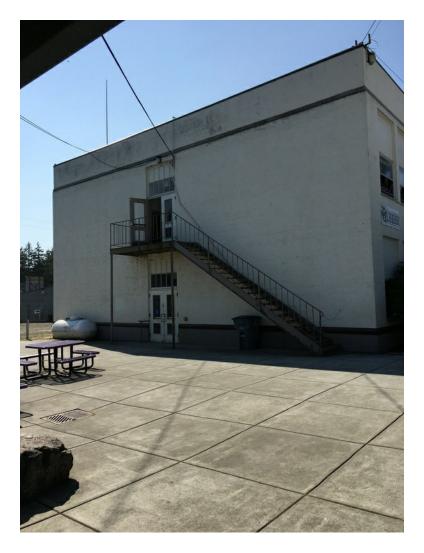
High School, North Elevation with Decommissioned Steel Stair
